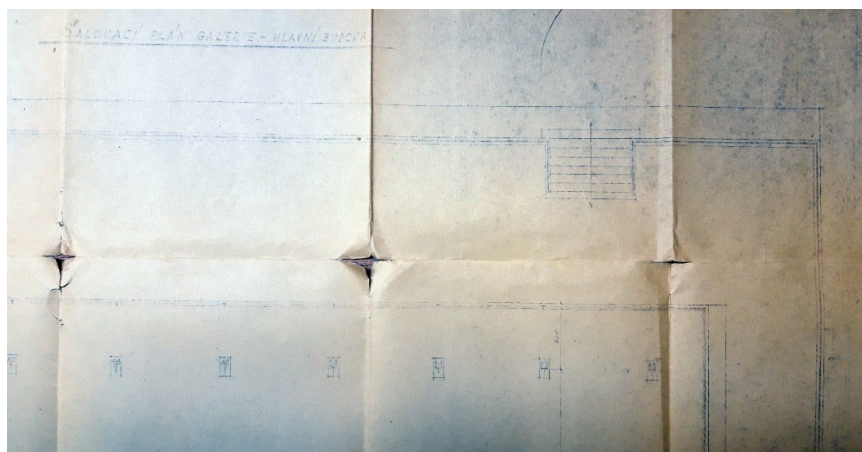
Drawing with a detail of the formwork drawing of the upper floor (1932).
